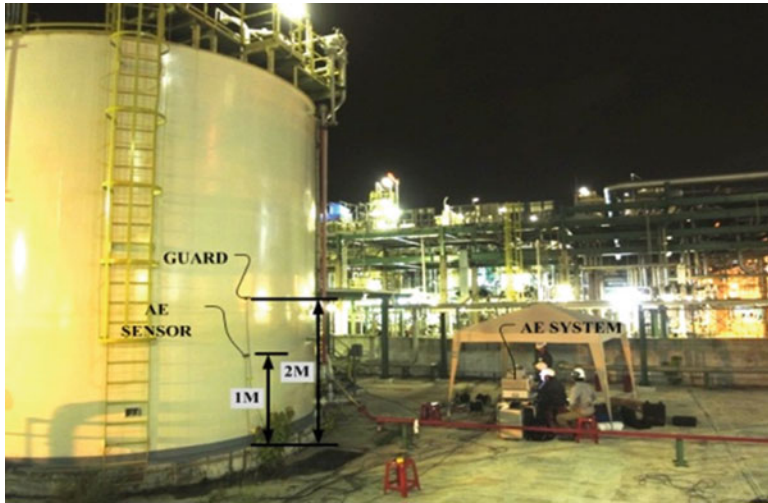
AE setting up for monitoring of corrosion on an AST bottom plate
